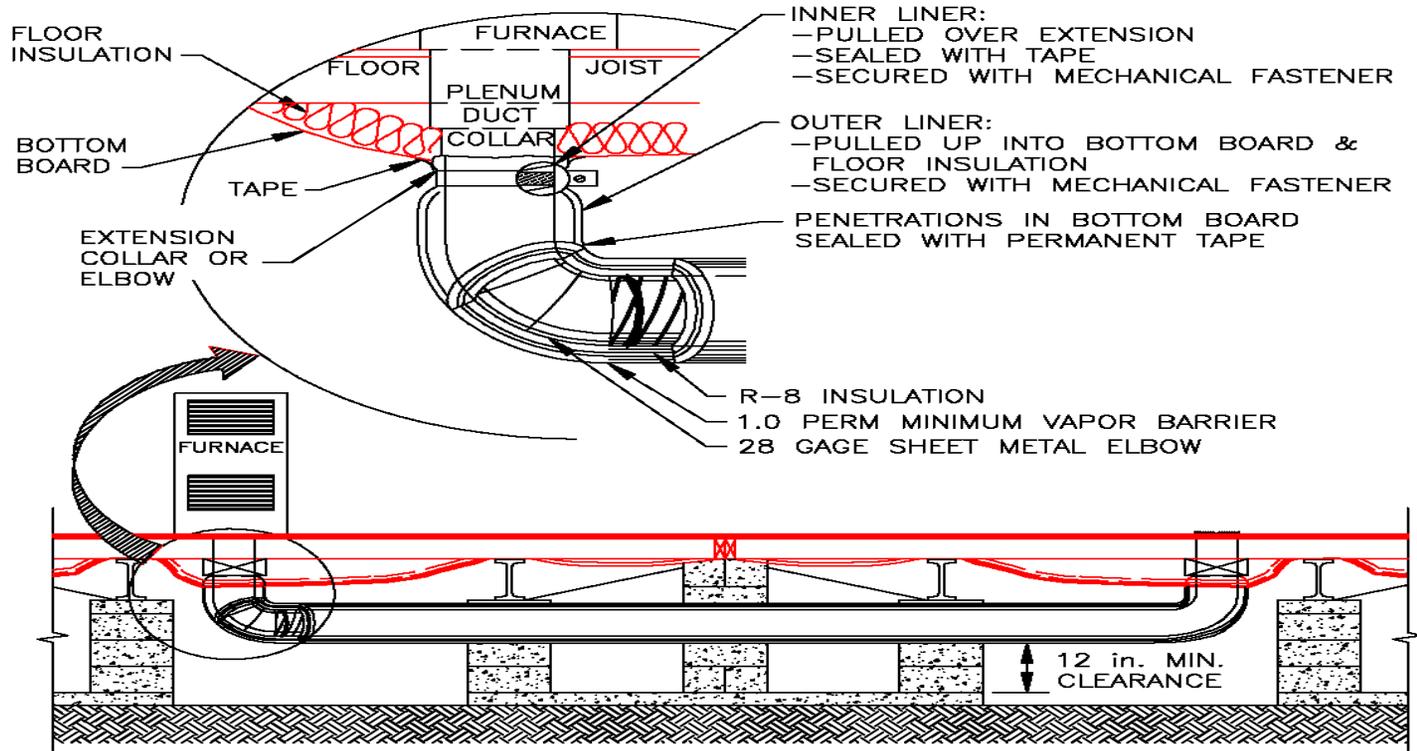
Typical Under-Floor Duct Crossover Connection
